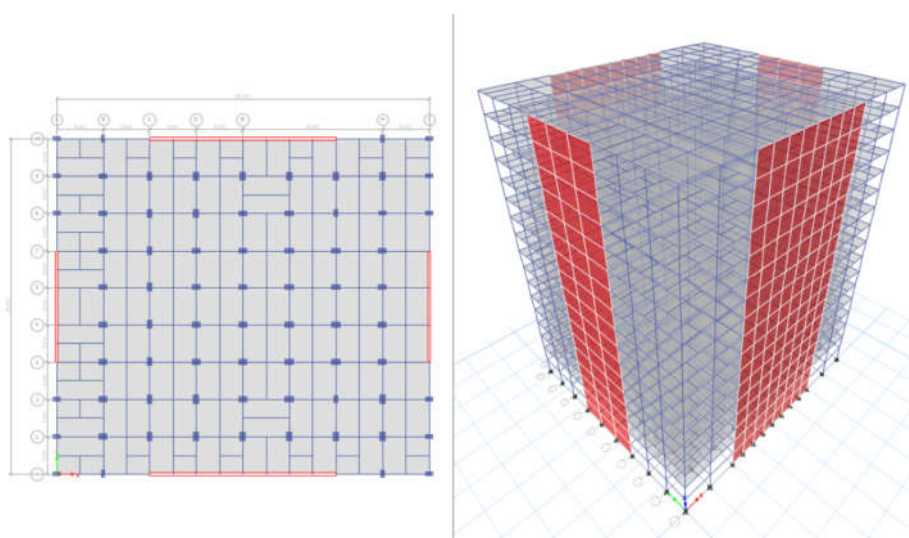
Plan and 3D View of G+15 Side Placed Shear Walls Structure Modelled in Etabs
